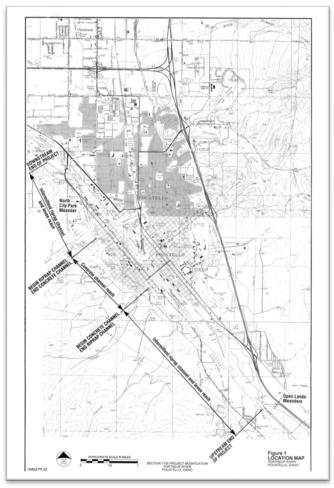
Flood Control Project Site Plan (from 1135 report)
